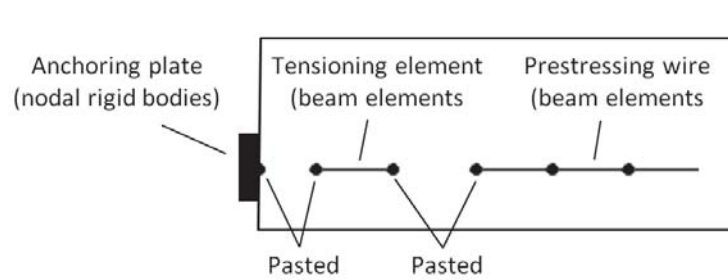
The tensioning element is pasted to the prestressing wire and the anchoring plate.
